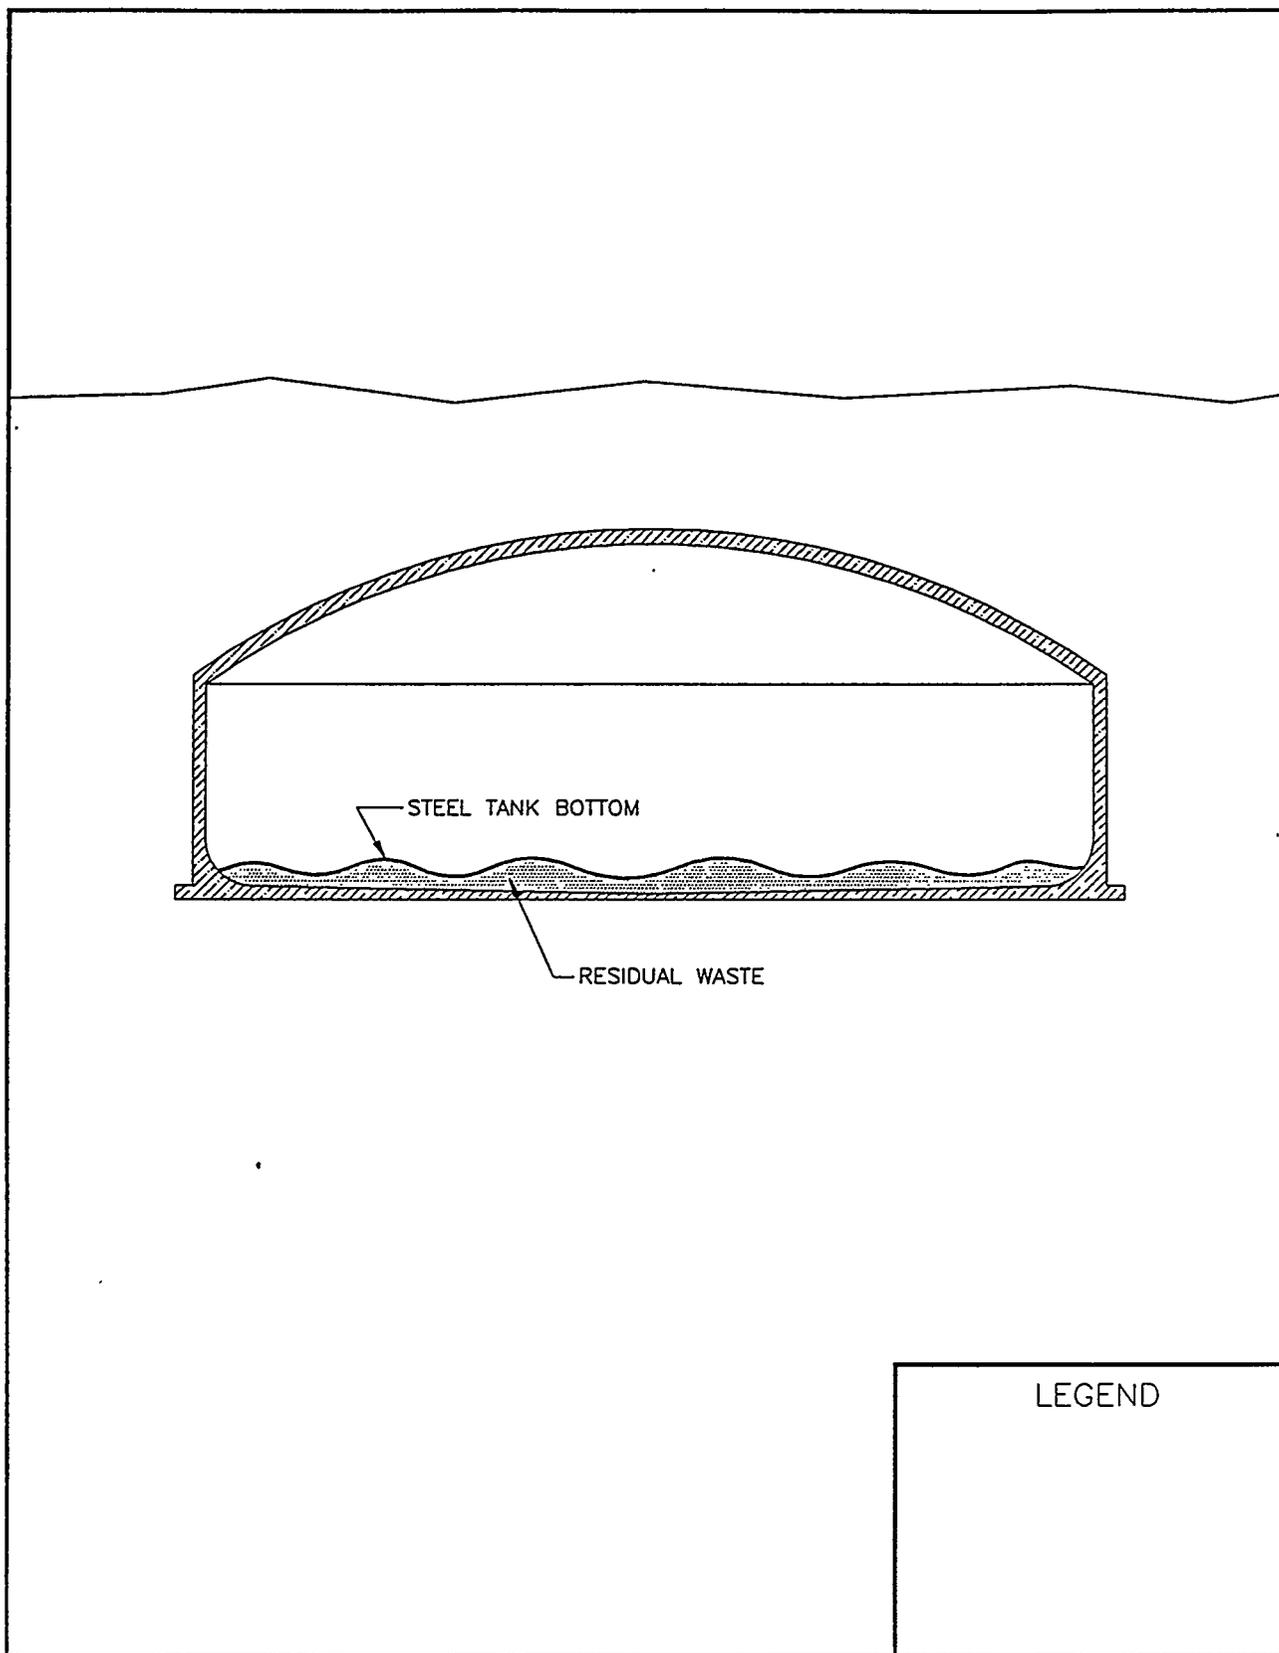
Residual Waste Trapped Between Tank Steel and Concrete Foundation.
